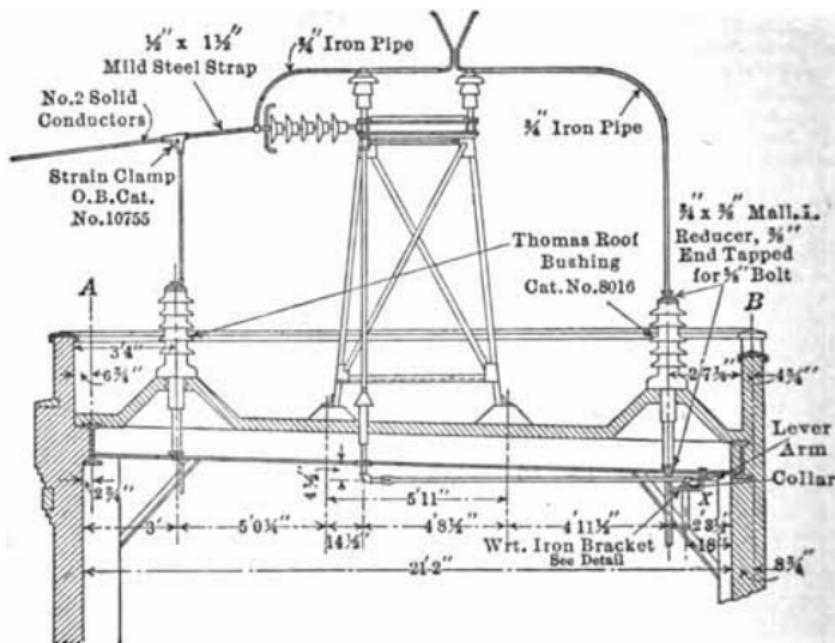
Typical roof construction showing horn gaps and roof insulators.
